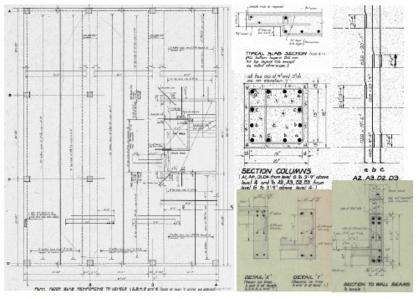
Structural System. Left: typical plan view; right: Column, beam and slab details
